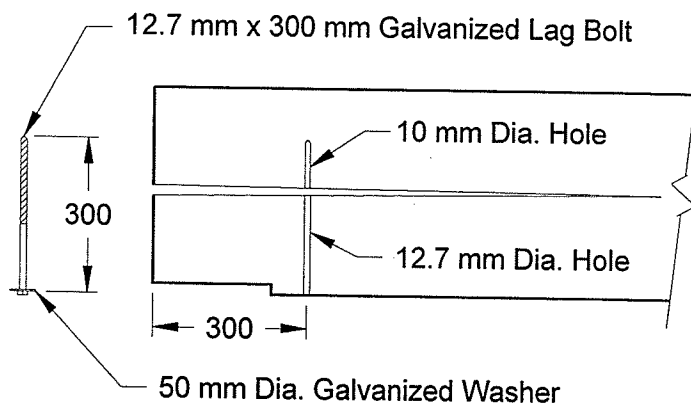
Placement detail of lag bolt used to hold splits closed
